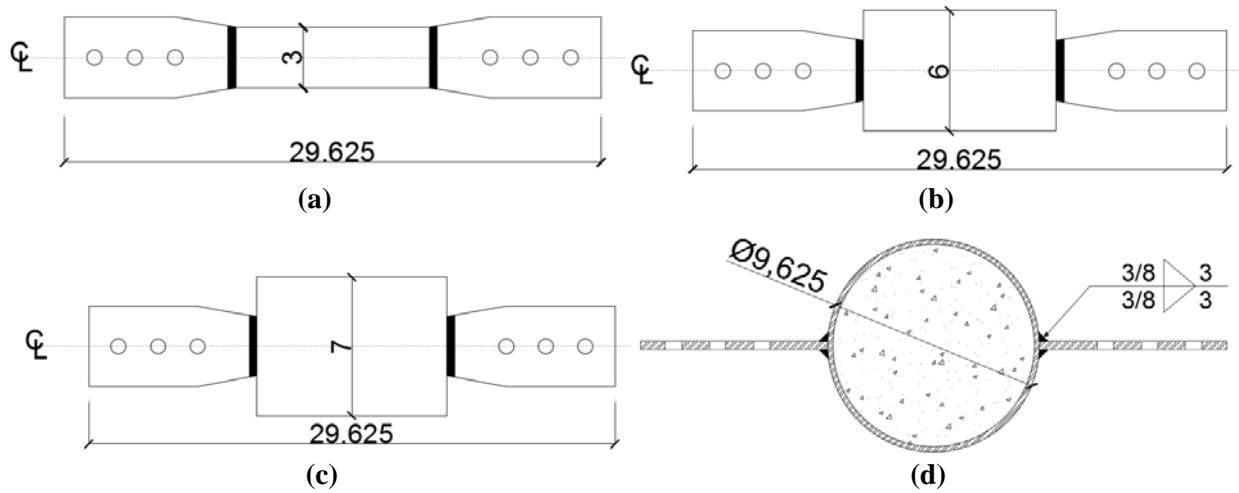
Test specimens with CHS of 9.625" diameter: top view of (a) Specimen D9.625L3; (b) Specimen D9.625L6; (c) Specimen D9.625L7; side view of (d) Specimen D9.625L3, D9.625L6 and D9.625L7 (unit: in.);
